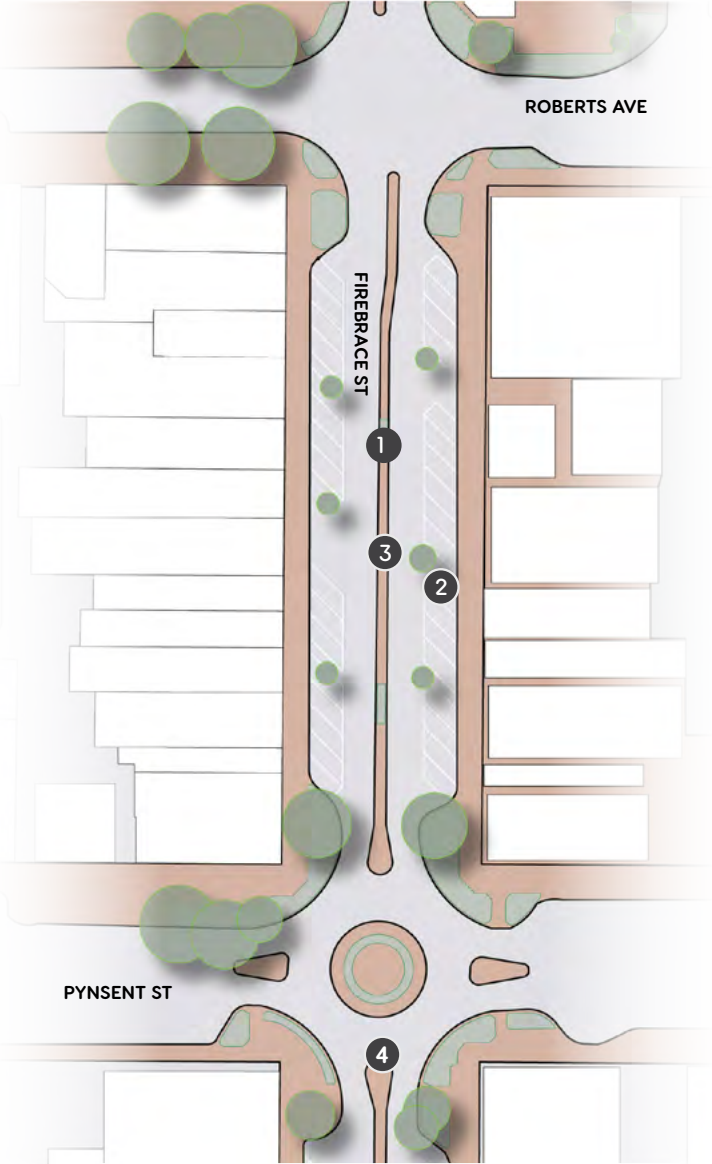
Existing conditions - typical block on Firebrace Street between Roberts Avenue and Pynsent Street
